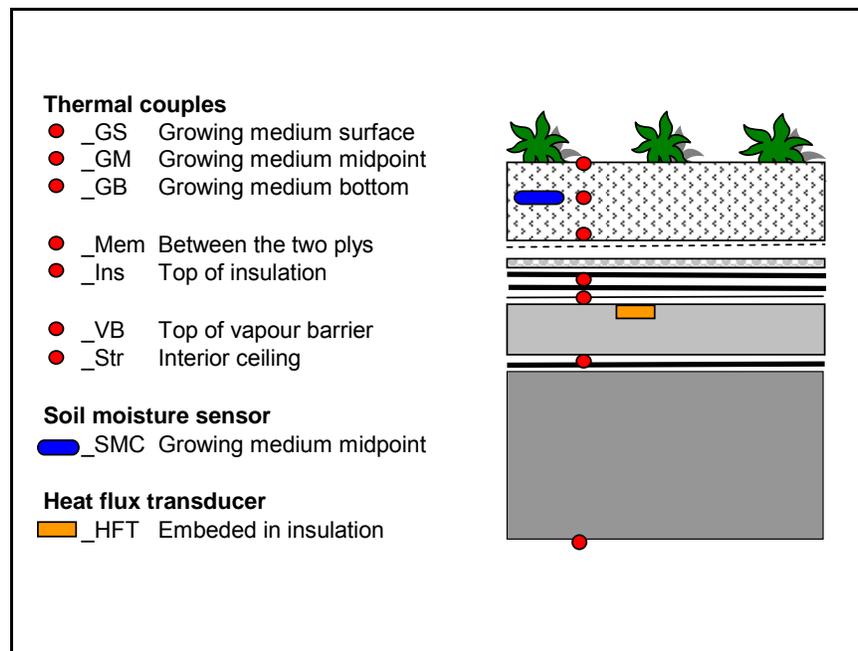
Cross-section of the BCIT Green Roof Research Facility's roofing system showing principal components and location of various sensors.
